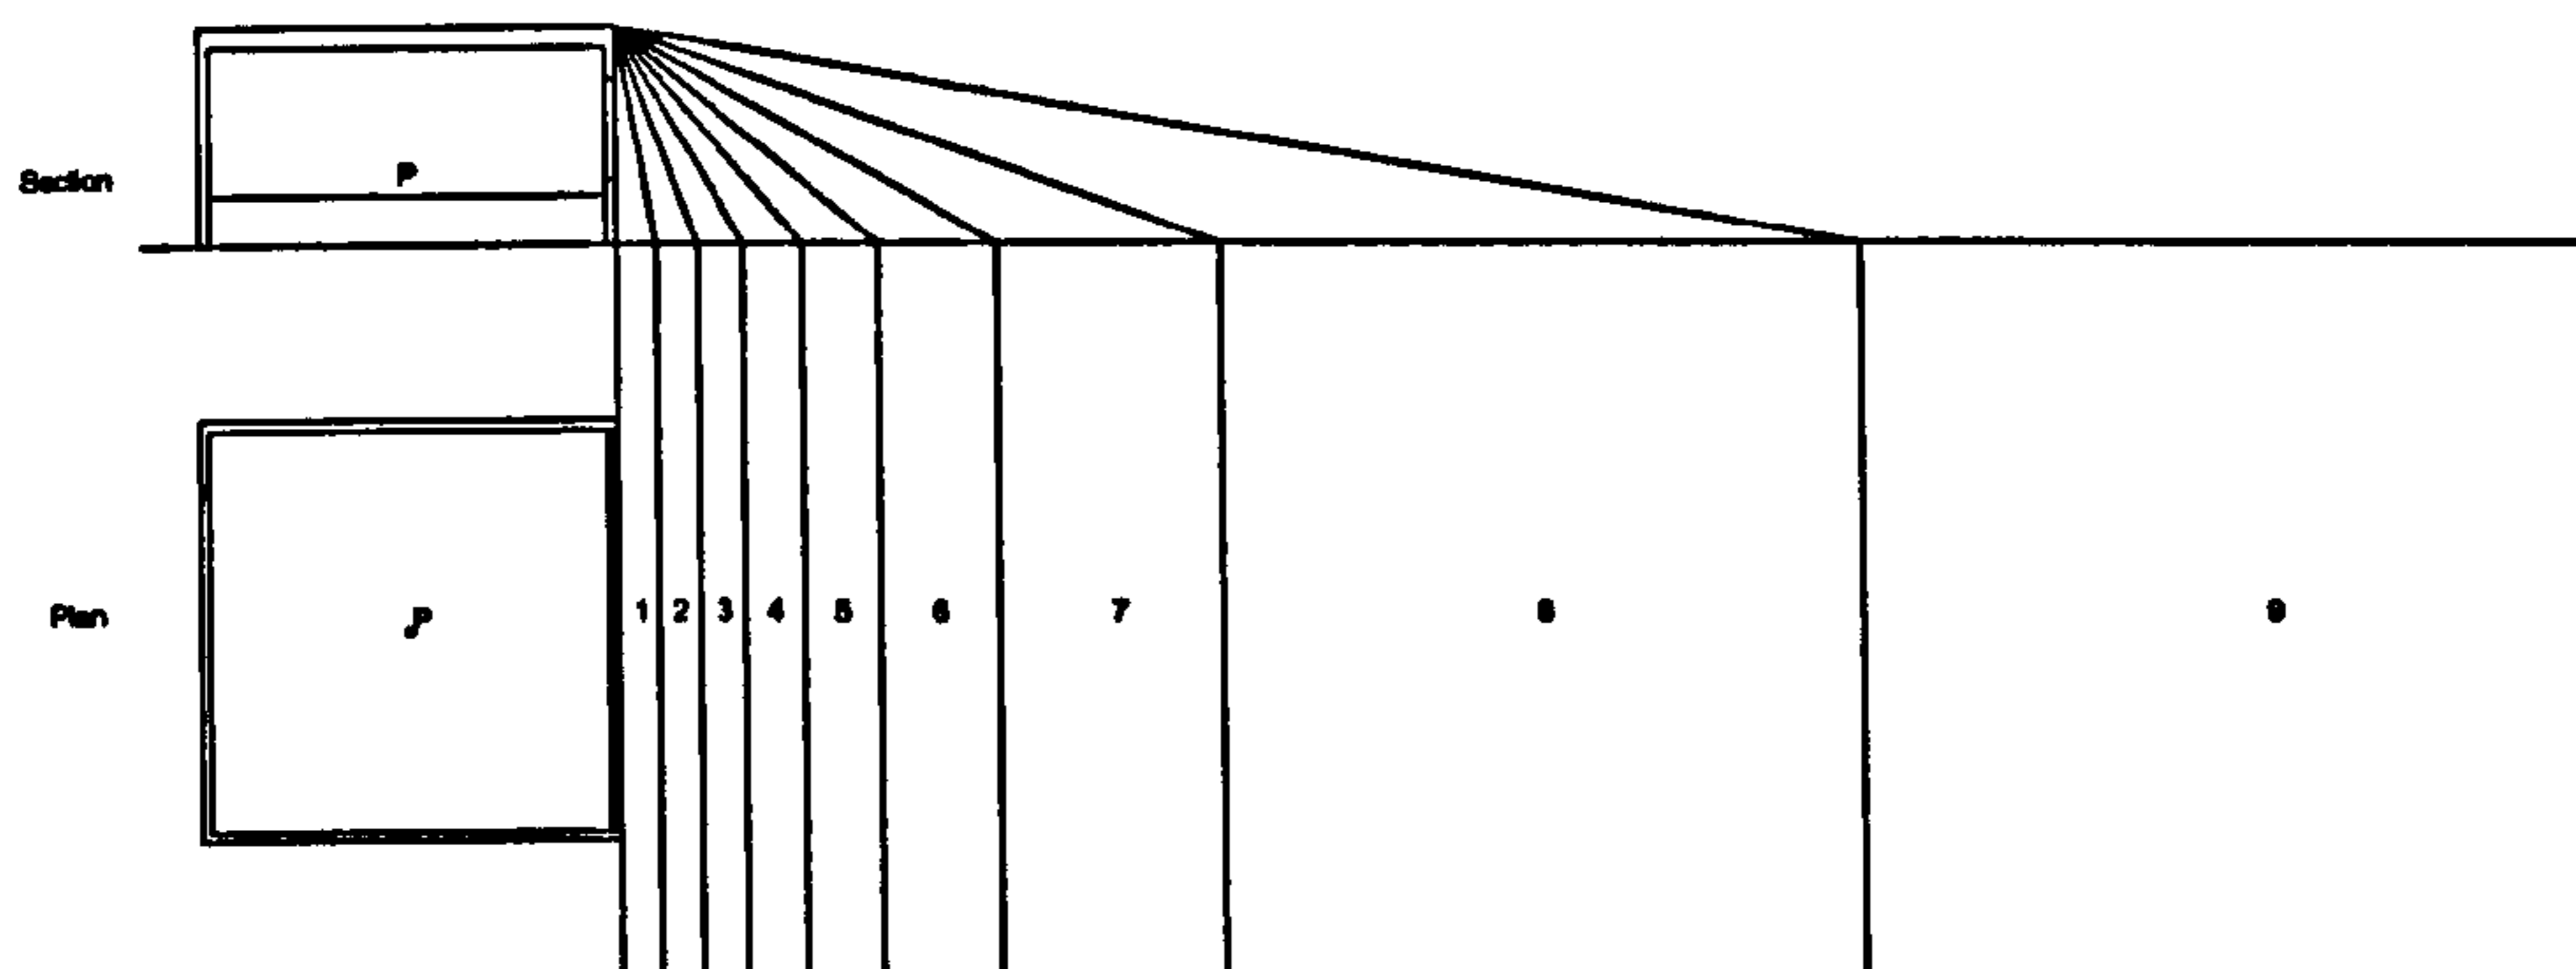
Ground patches and Reference Room - Section and Plan
